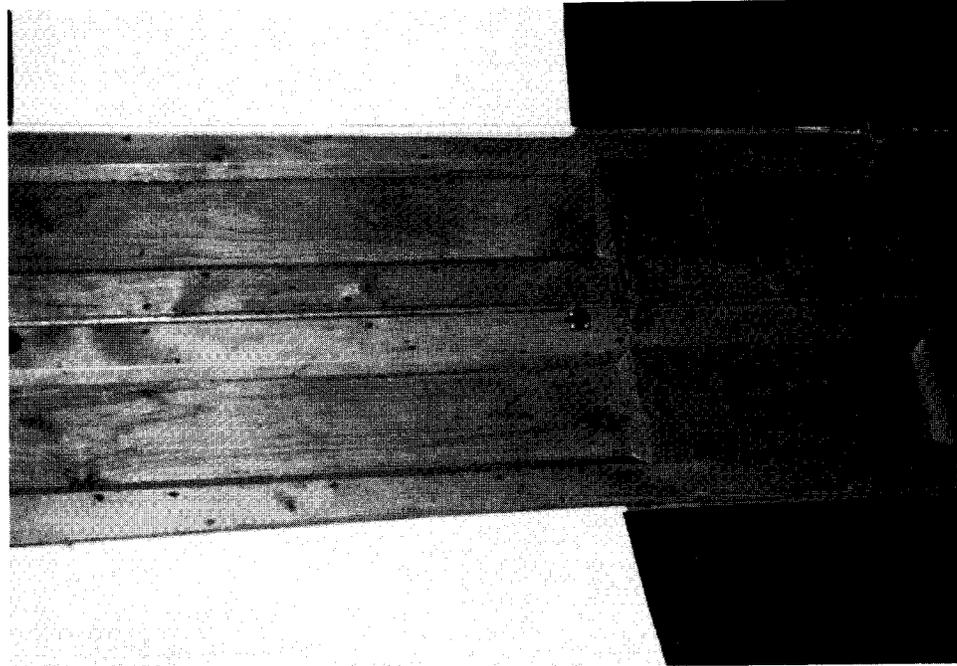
Room 112, innermost of three doors in exterior doorway from Watch Deck to Watch Gallery.
